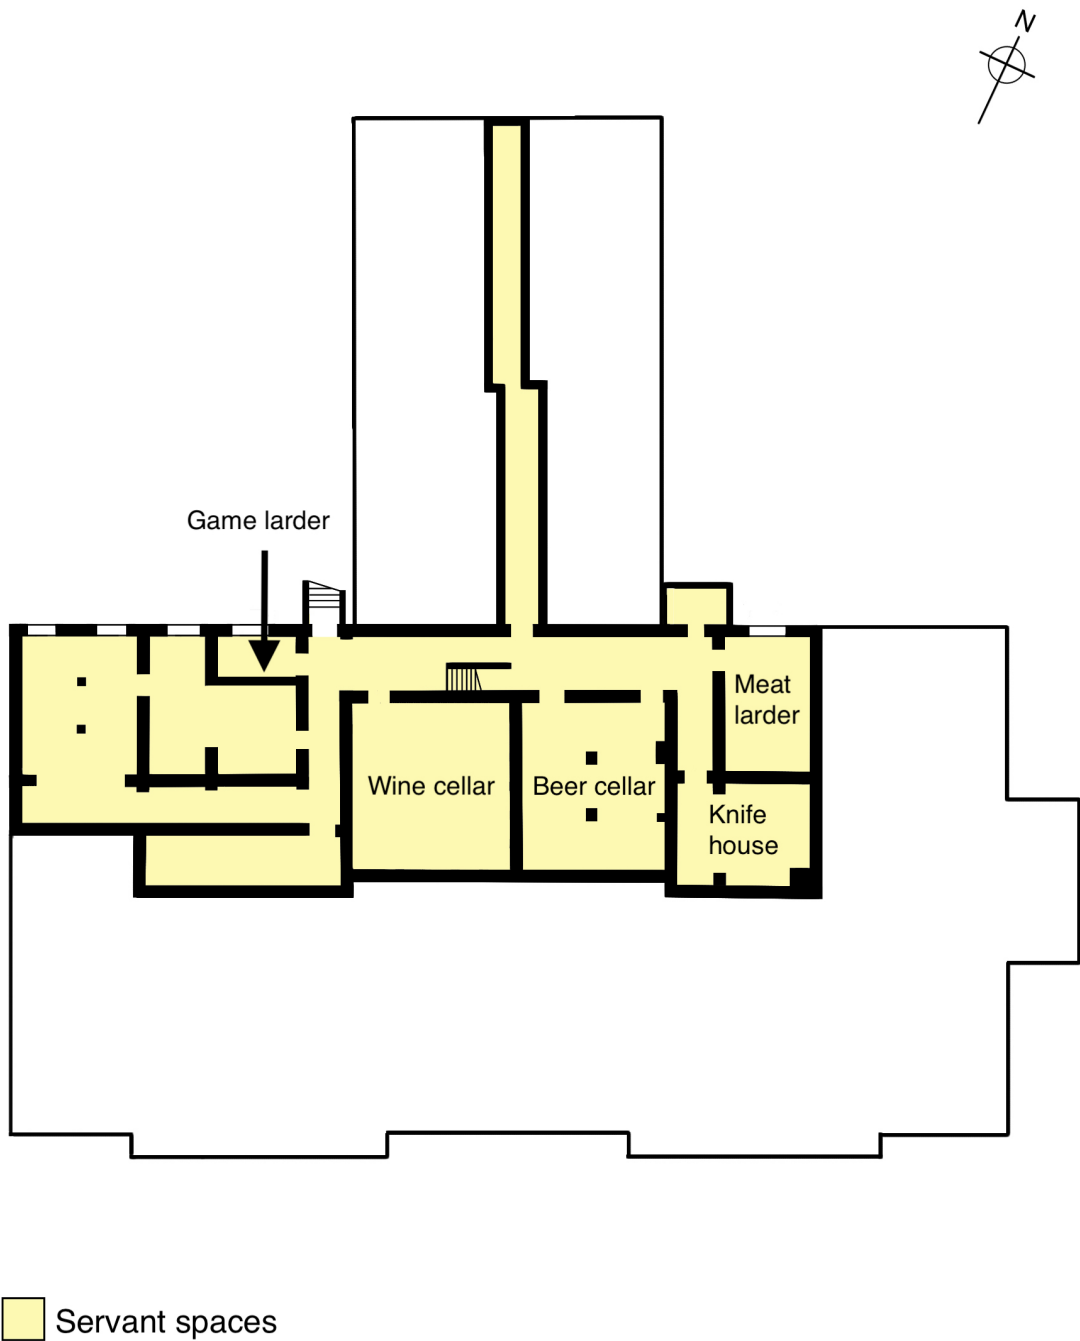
Brodsworth Hall basement floor plan (based on English Heritage)
